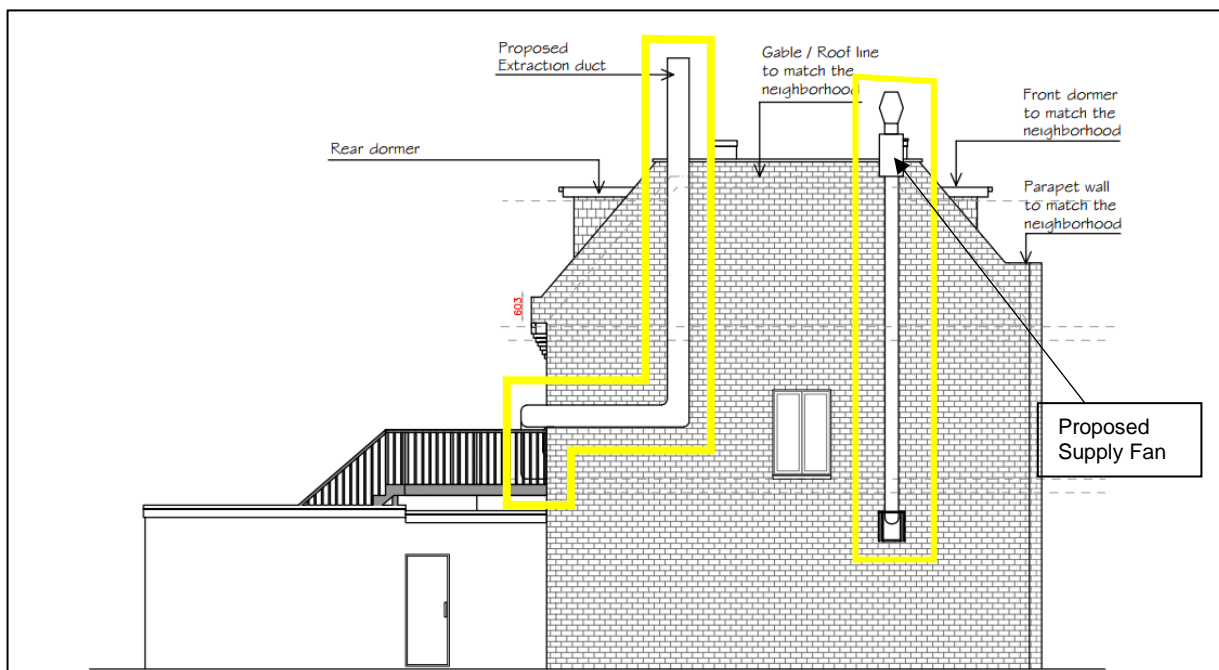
Proposed side elevation showing the proposed installation location of the extraction system ducting and exhaust
